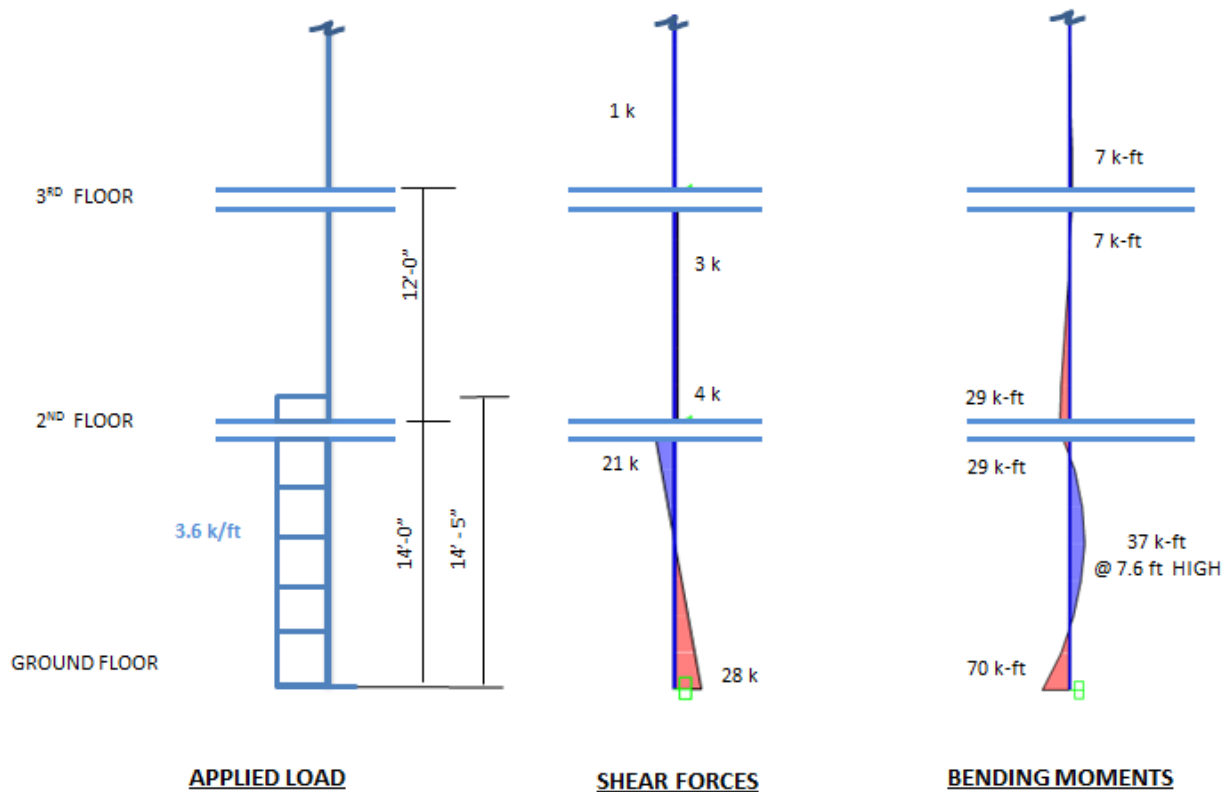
Hydrodynamic loading on interior column of Hilo office building due to Load Case 2
